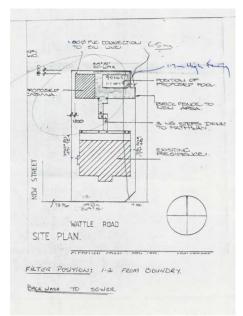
Design for addition of swimming pool and outbuilding (cabana). (Source: BP 1986, BH_86_4260)
